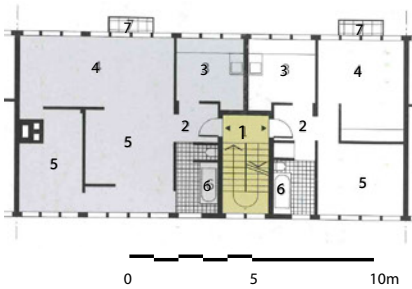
Weissenhofsiedlung Apartment Building, Stuttgart, Germany, 1927, Ludwig Mies van der Rohe
